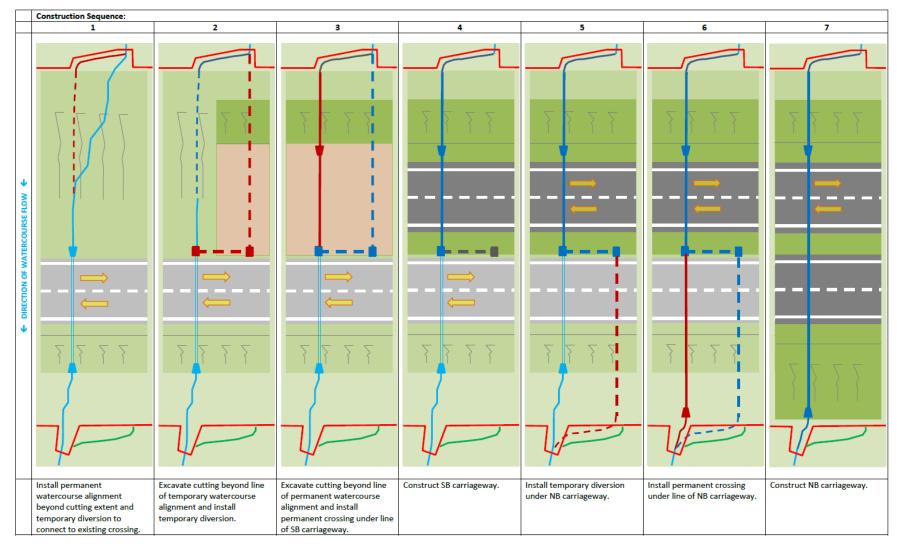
Widening to the east - road in cutting - on-line watercourse alignment
